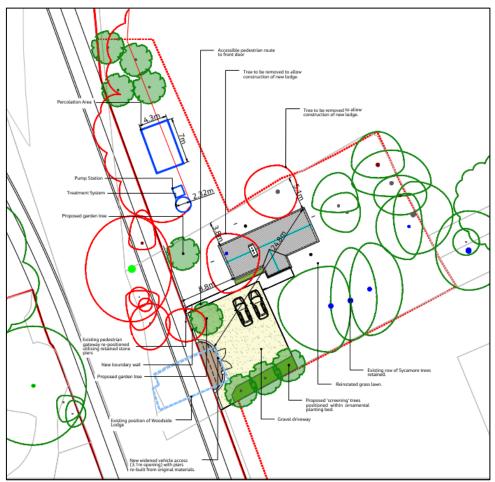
Extract from Proposed Woodbrook Side Lodge General Arrangement Drawing
